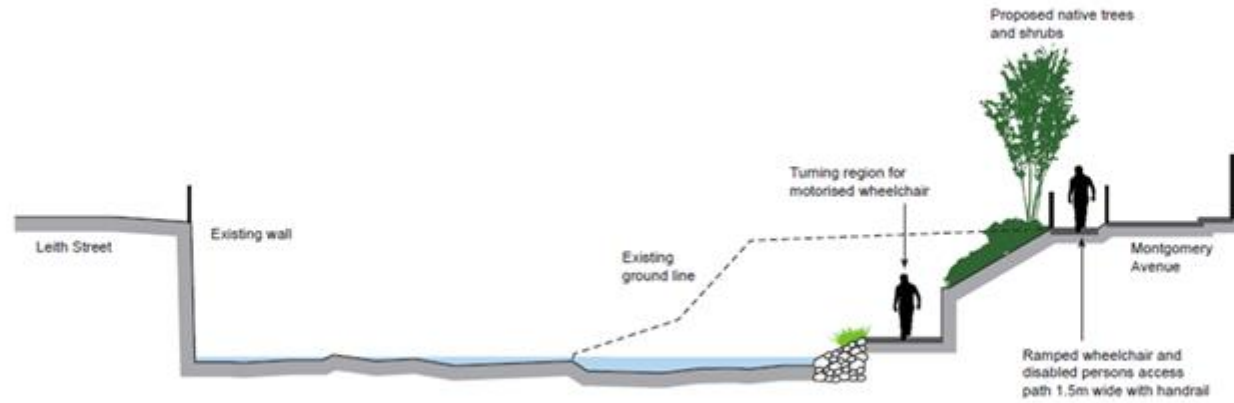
Cross-section B – B, downstream of Dundas Street Bridge (looking downstream)
